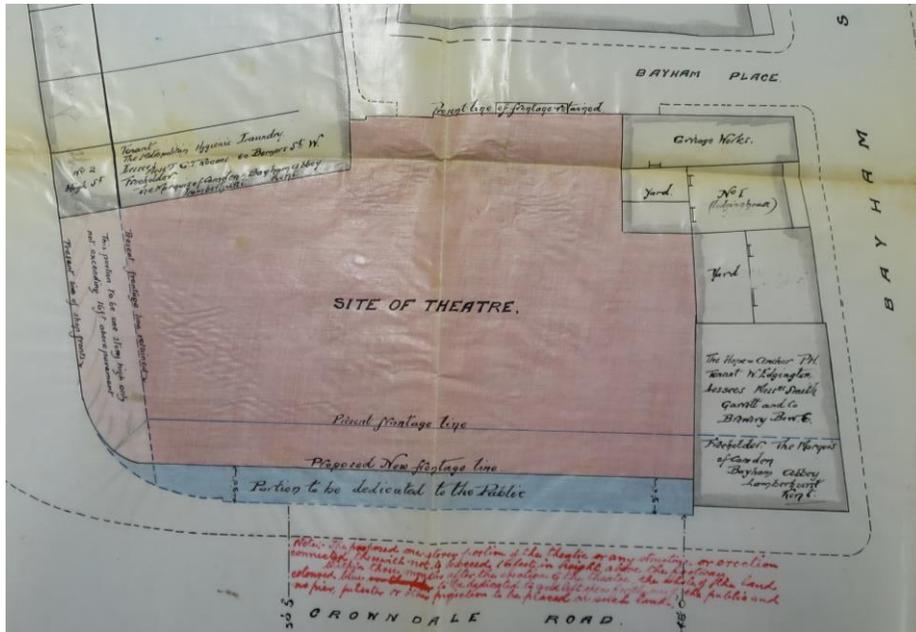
Site plan by WGR Sprague, 1899. This shows the proposed outline site of the theatre and the existing Hope & Anchor, 1 Bayham Street (lodging at the time) and 65 Bayham Place (Carriage workshop). Here the gap between the Hope & Anchor and 1 Bayham Street has been infilled. ‘Present line of frontage to be retained’ on the north elevation – the existing building frontage still remains mostly intact with a few alterations.
